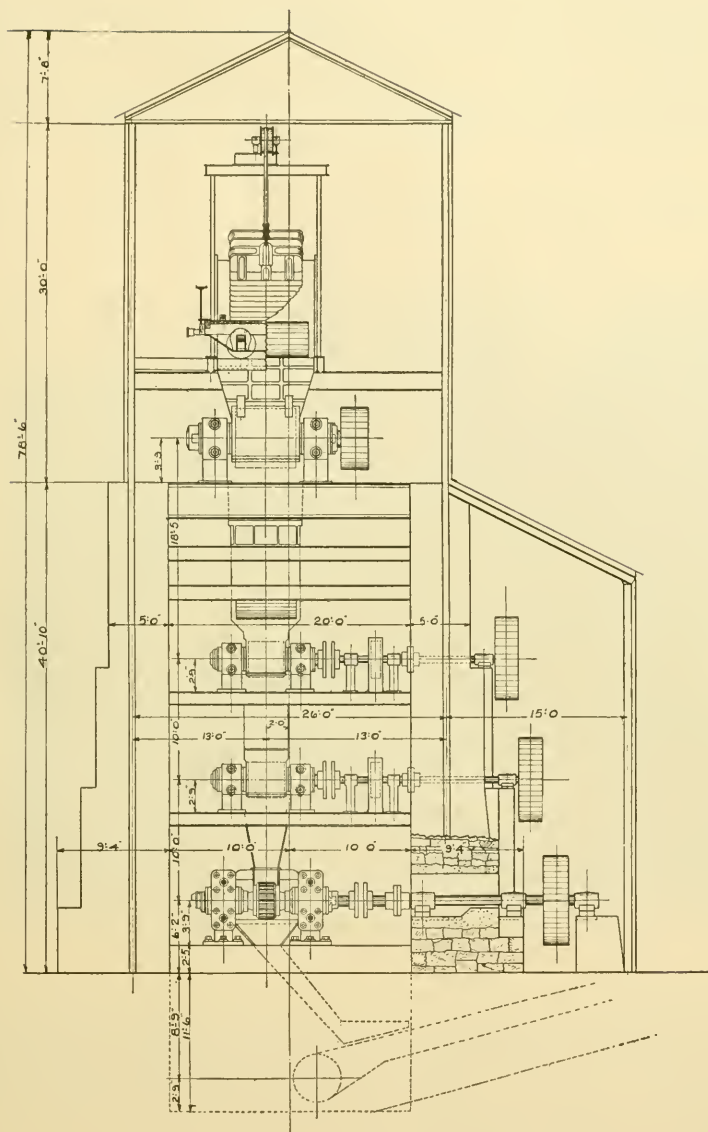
END ELEVATION OF THE CRUSHING PLANT OF THE EDISON PORTLAND CEMENT COMPANY
